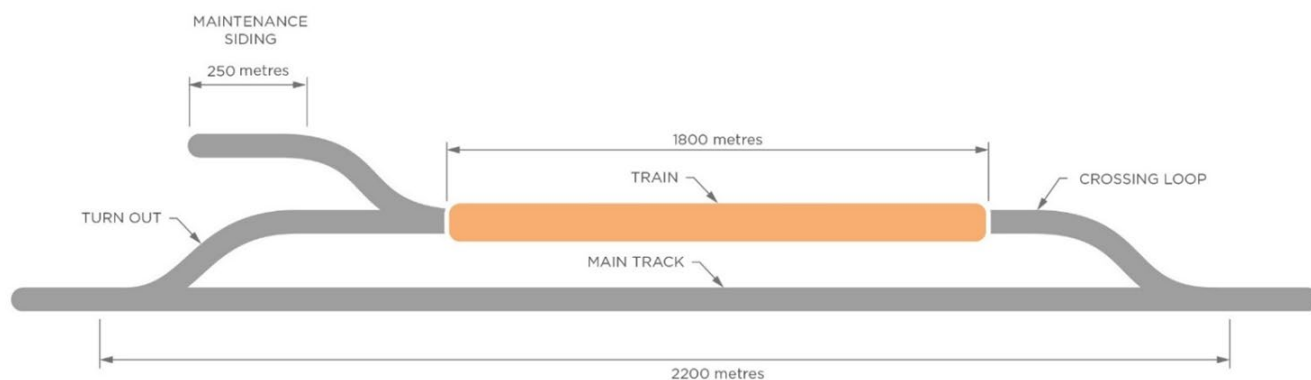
TYPICAL LAYOUT OF A CROSSING LOOP
